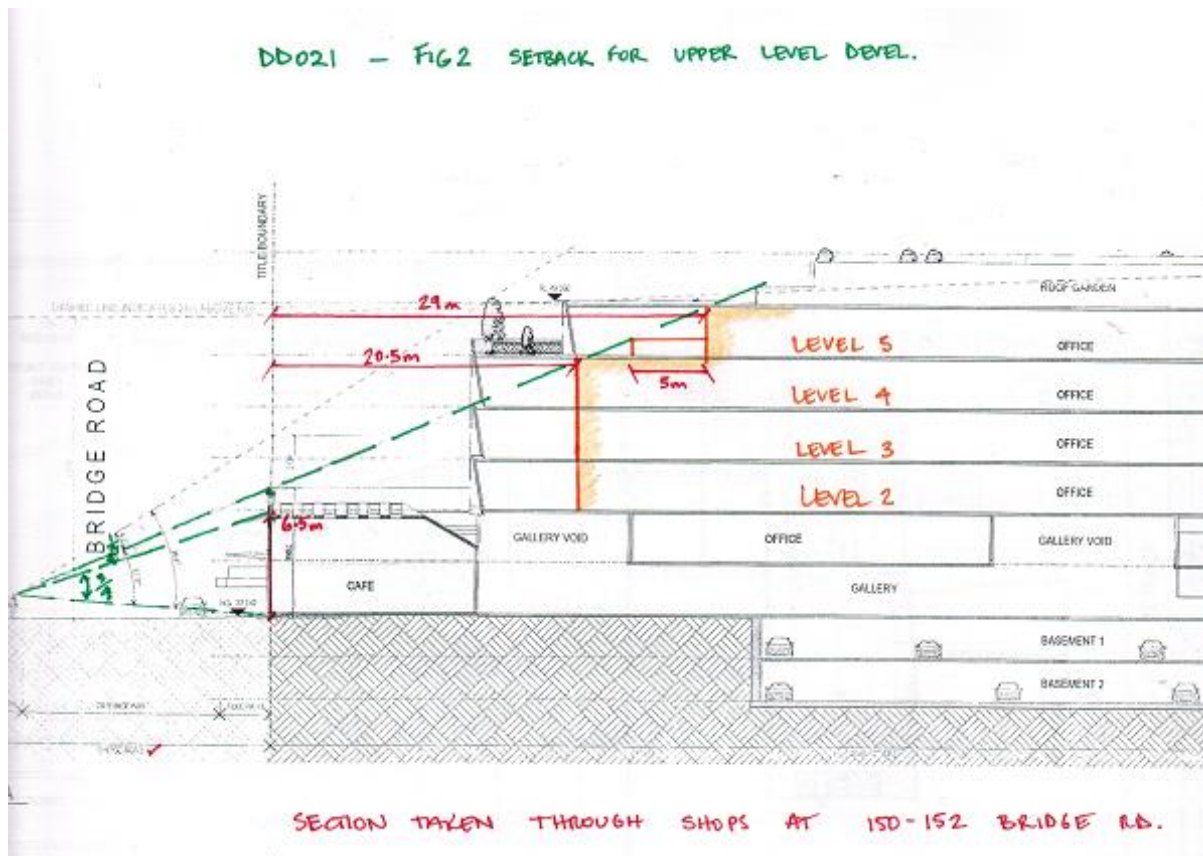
The DDO21 upper level setback requirement at the Bridge Road frontage
